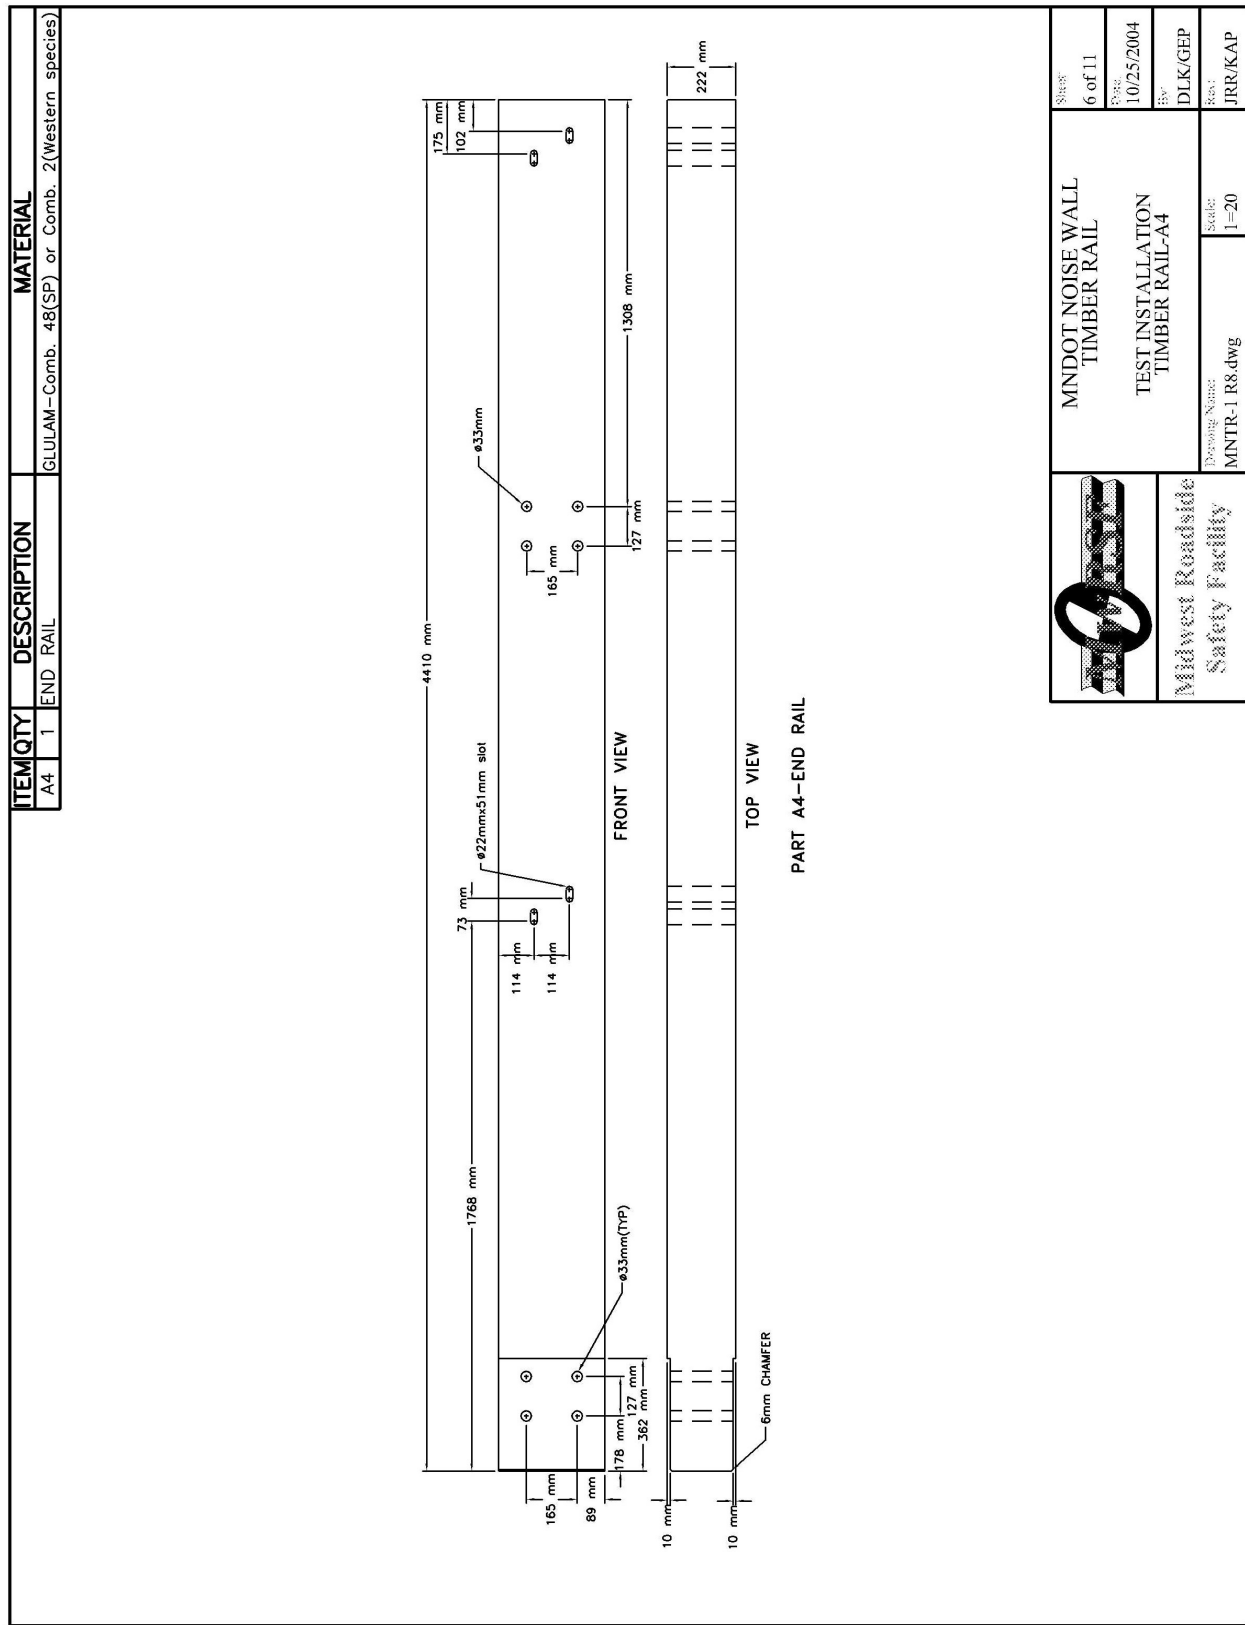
Mn/DOT's Timber Rub Rail Design End Rail Details
